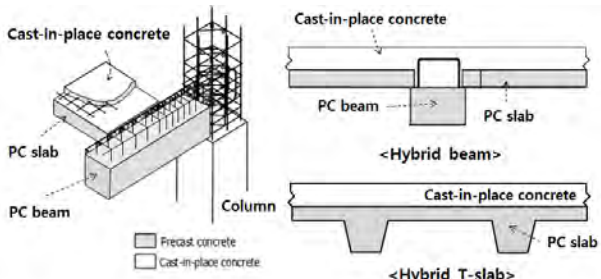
Hybrid construction method using precast concrete and cast-in-place concrete
